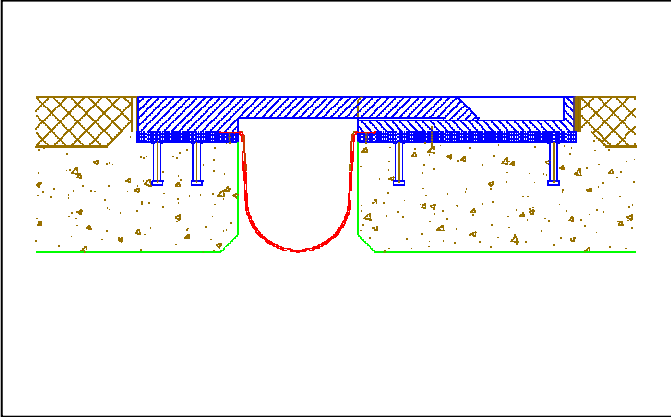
Sliding finger joint (metal-elastomeric bonded system) - Cross-section
